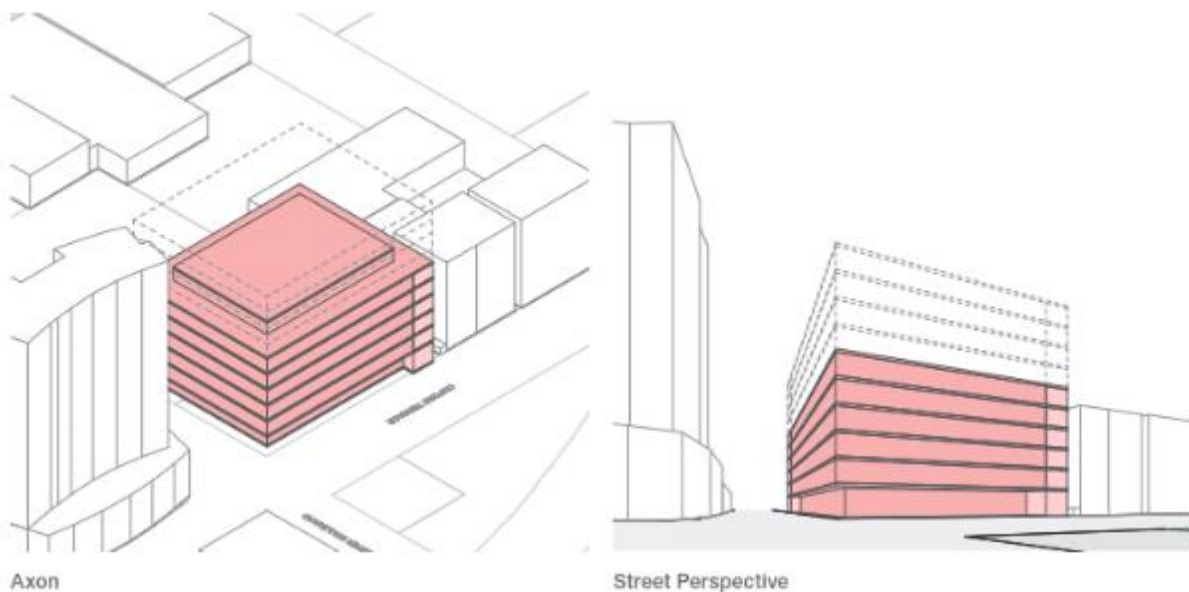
Modelling of the road wall height illustrating integration with existing building heights.
